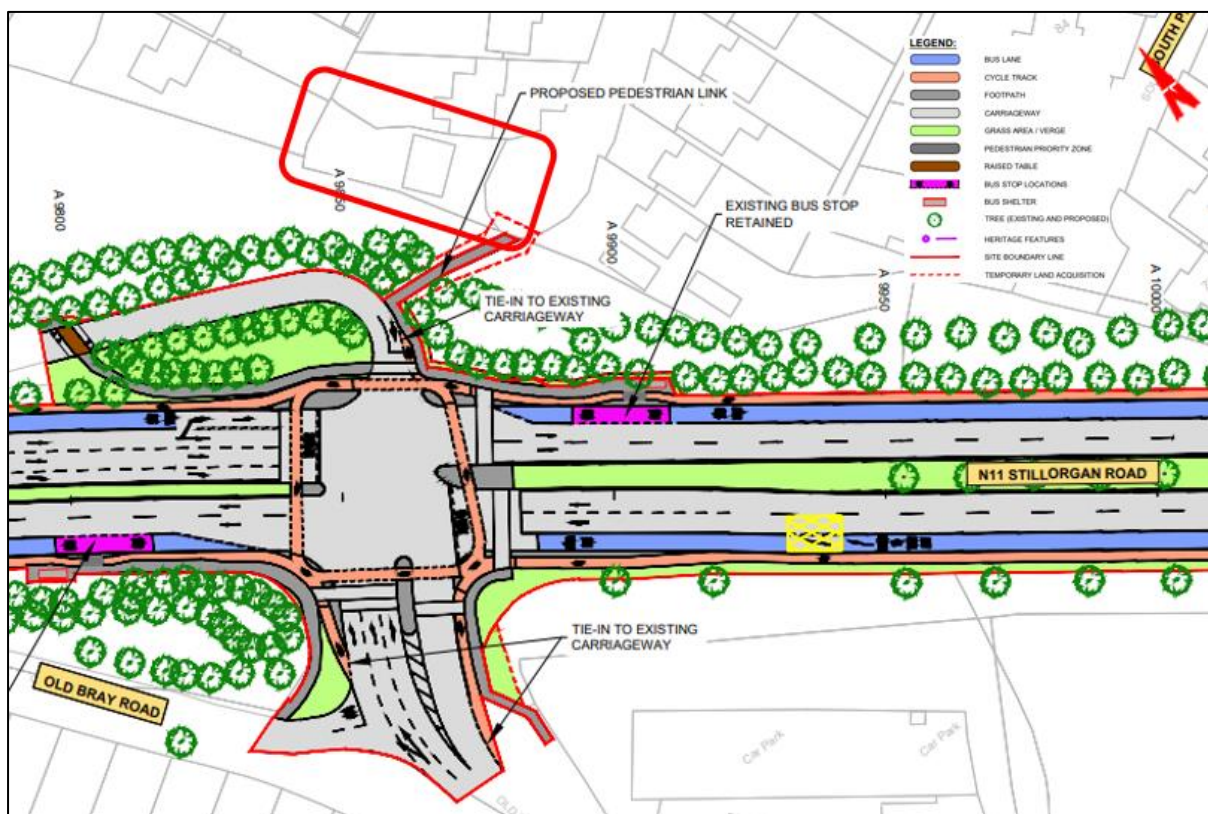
Extract from General Arrangement Drawing at South Park (Sheet 29)
